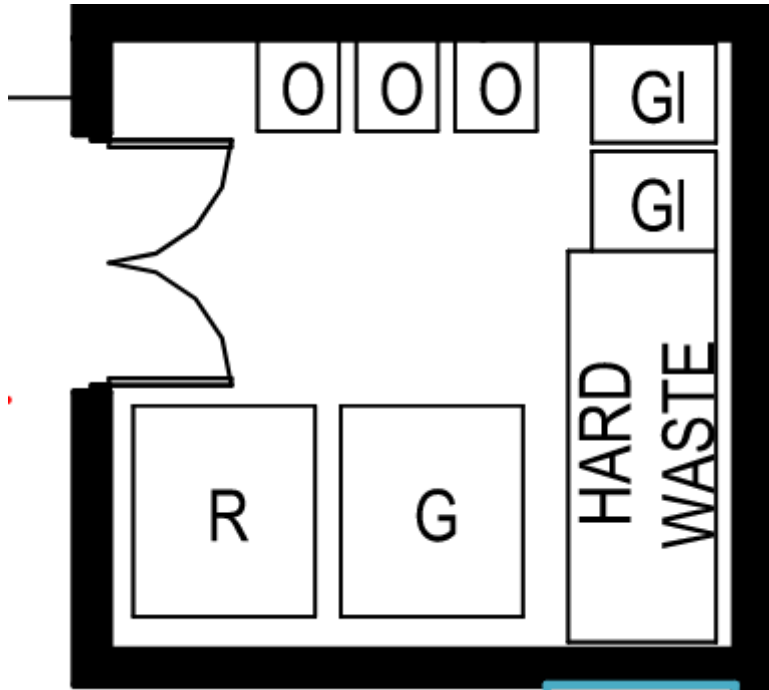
Southern Residential Bin Room Waste Storage Layout
